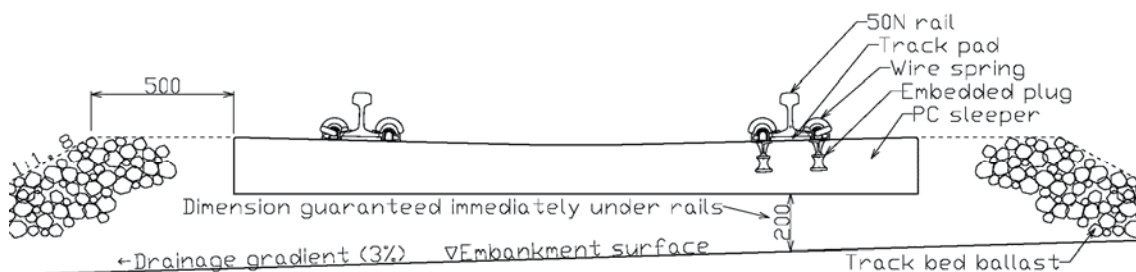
Standard Track Cross-section at Rolling Stock Depot.
